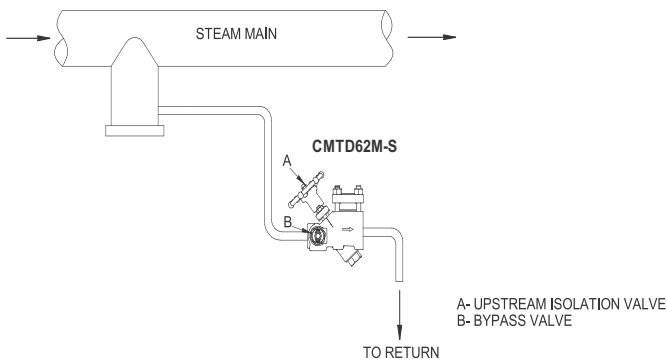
Typical installation of Compact Module - Thermodynamic Trap [CMTD62M-S]
